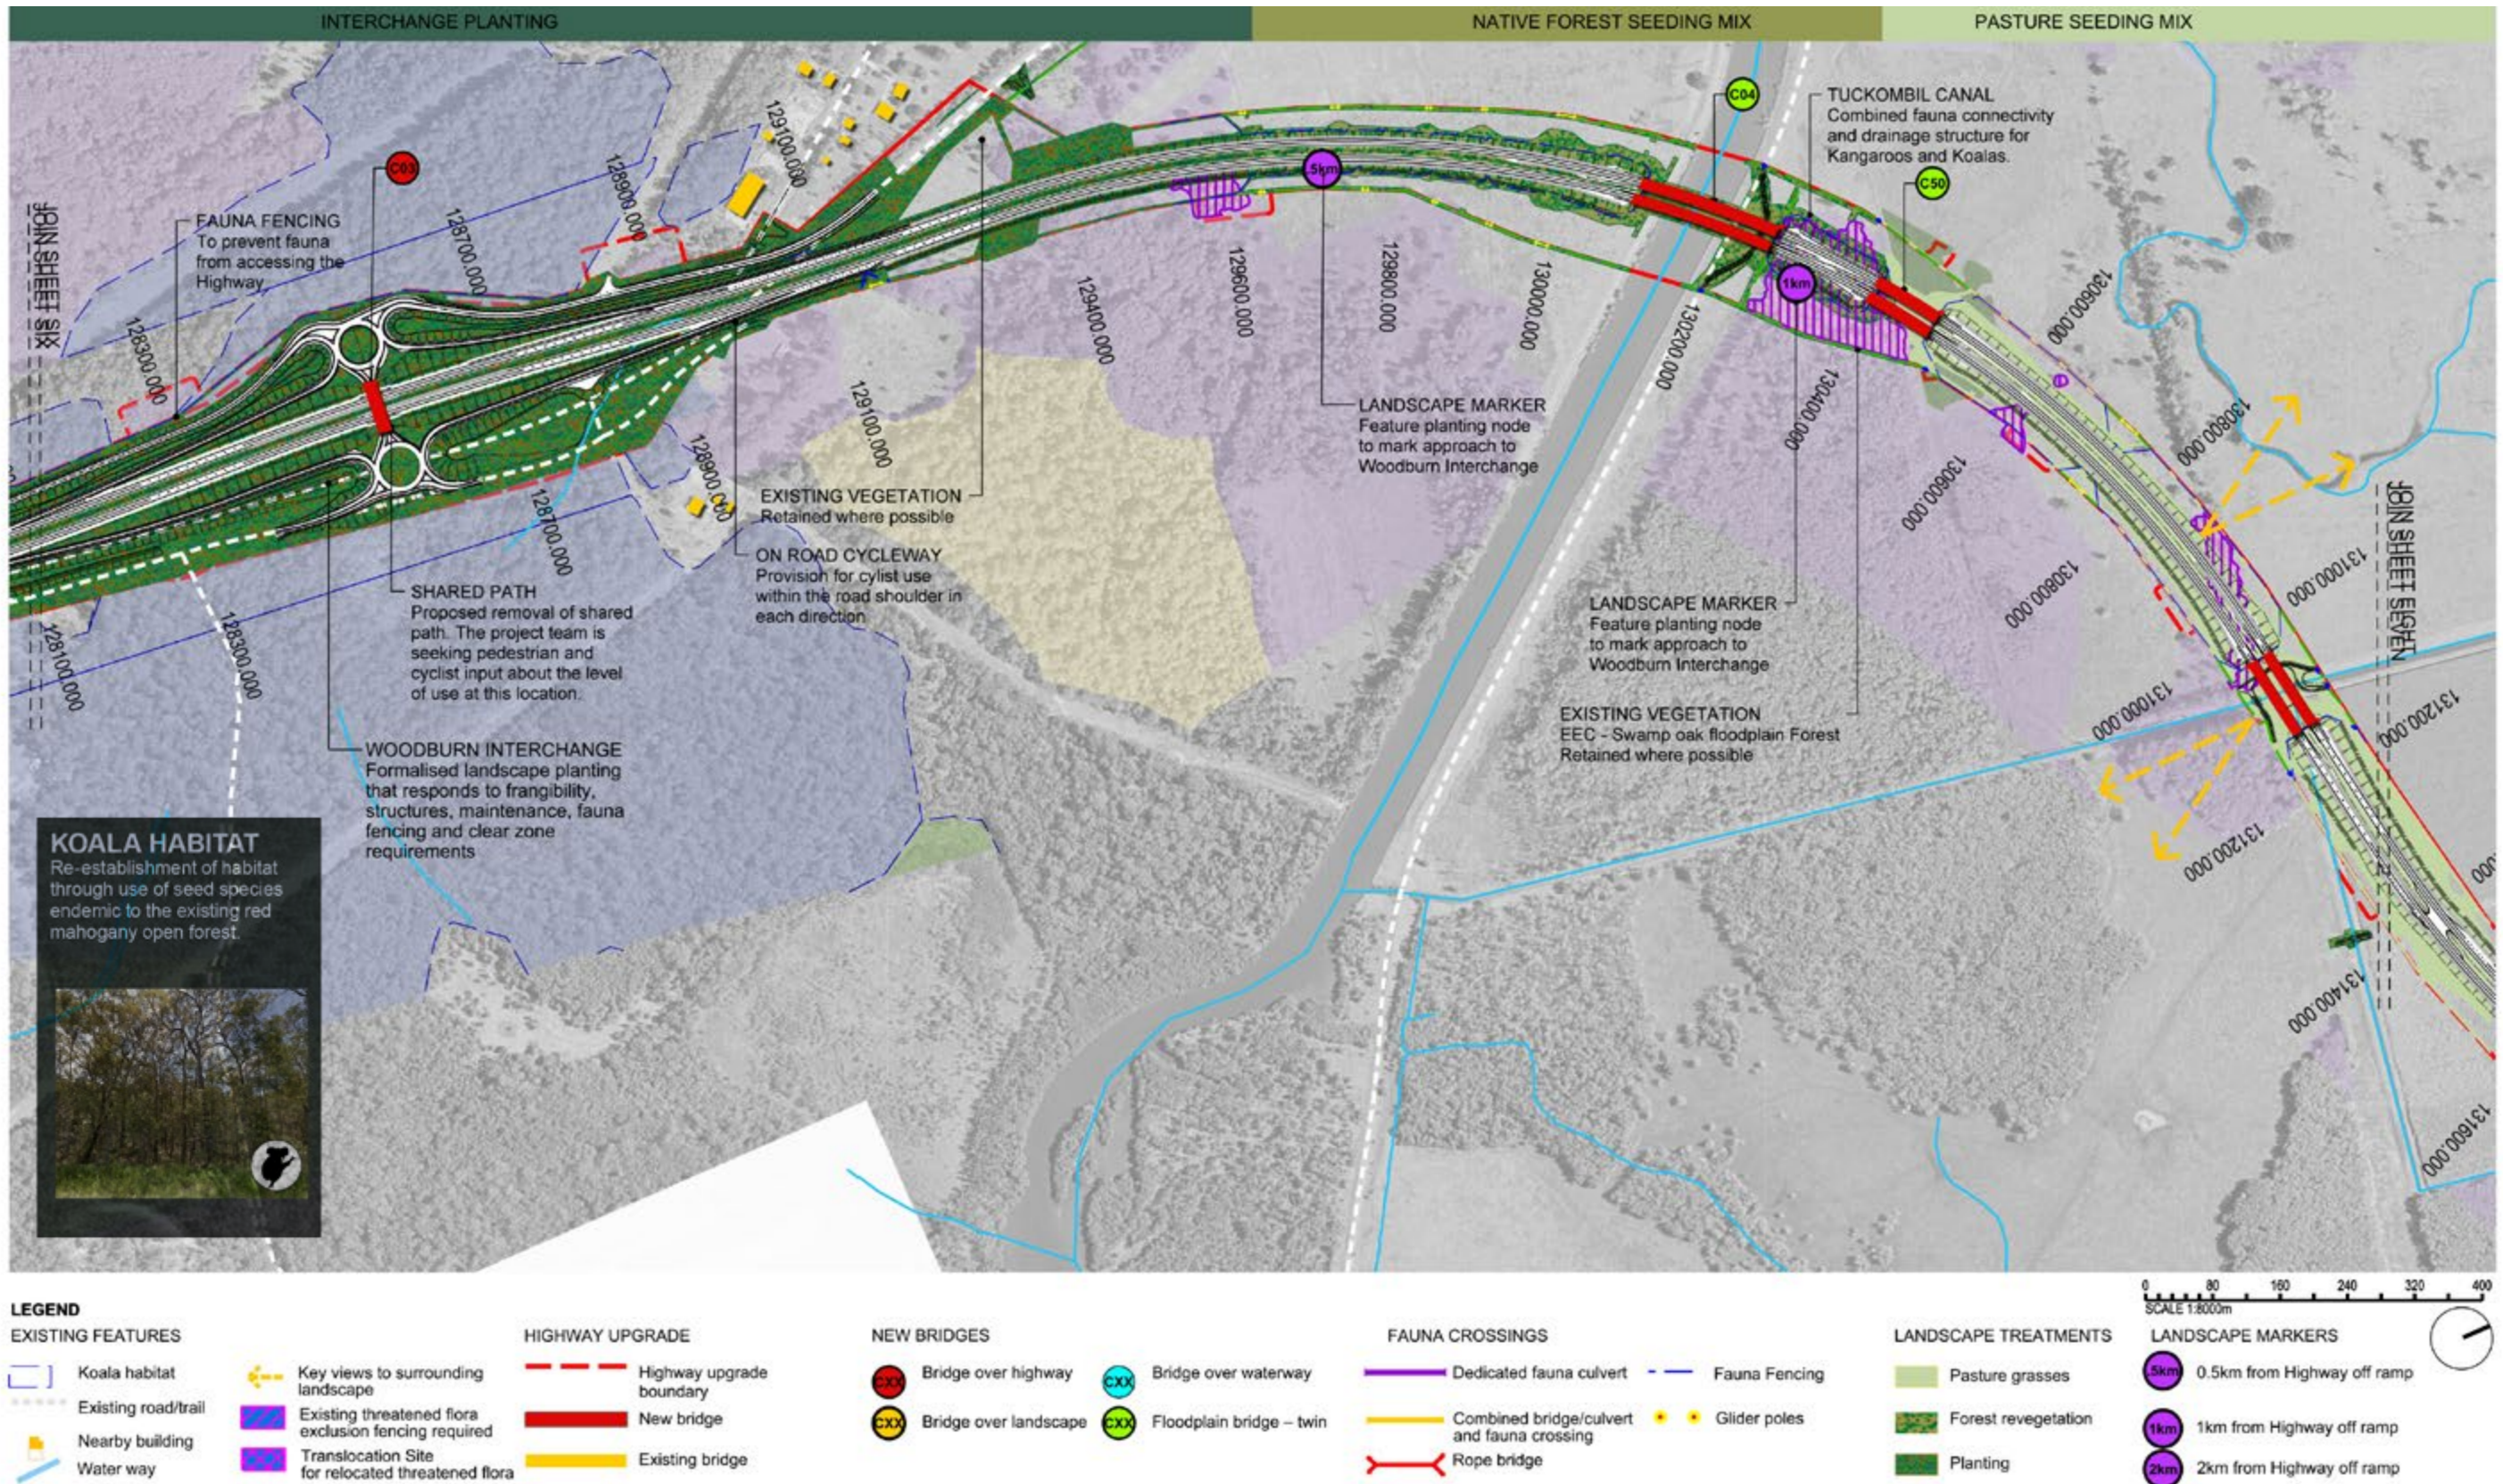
Urban and Landscape Design Strategy Plan – Trustrums Hill to Broadwater National Park – Sheet 7
